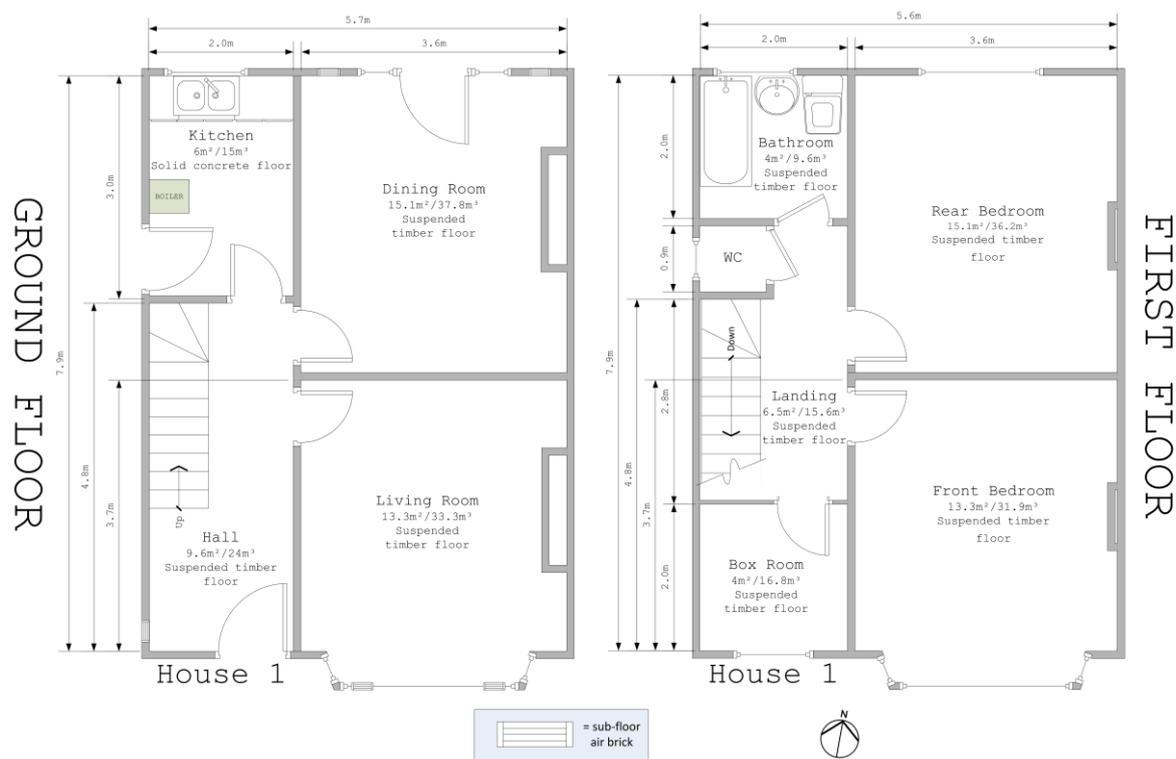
Floor plan of house 1 (right side wall is a party wall).
